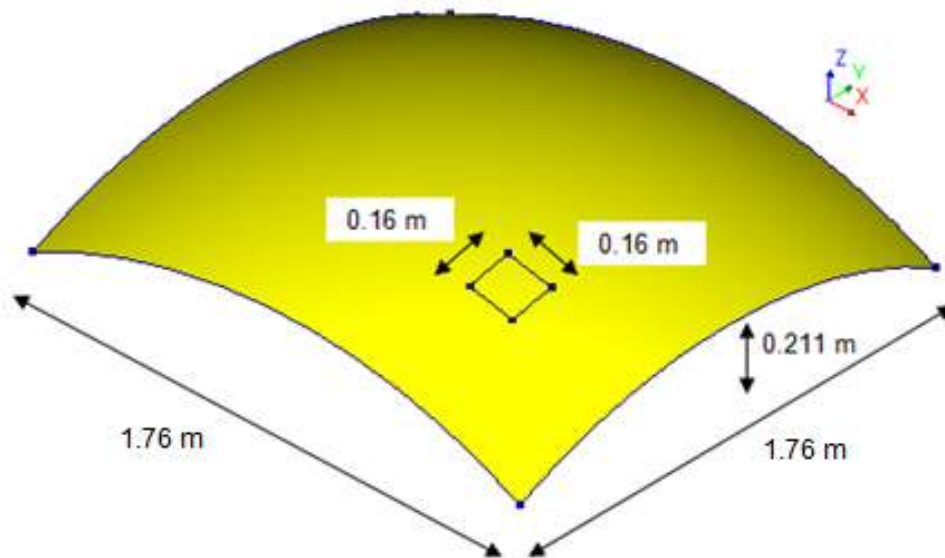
Dimensions of Shell model Tile vault and Composite Tile – Concrete Sail Dome.
